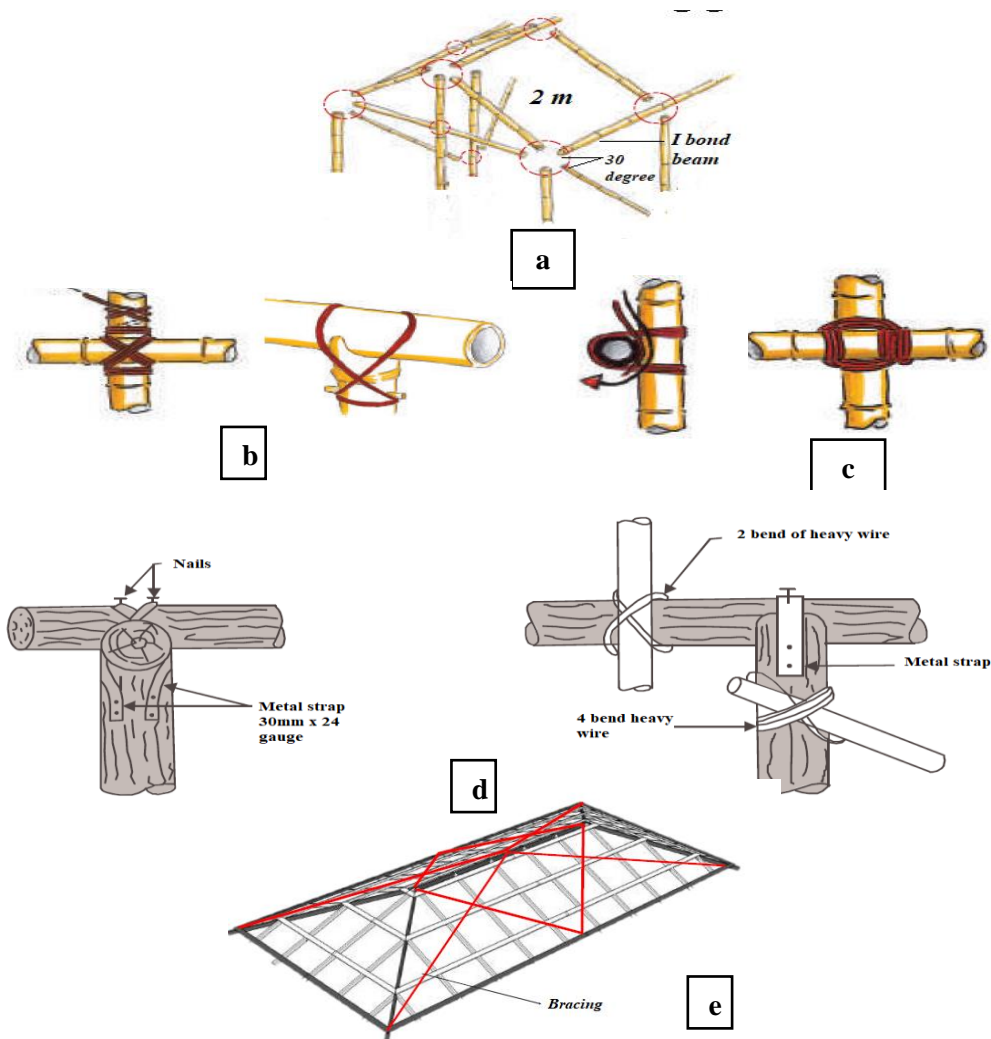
Framing & anchoring of the roof. (a) Frame joint (b) diagonal lashing using GI wires (c) square lashing using GI wires (d) Using metal straps for more stability (e) Bracing to reduce wind load.
